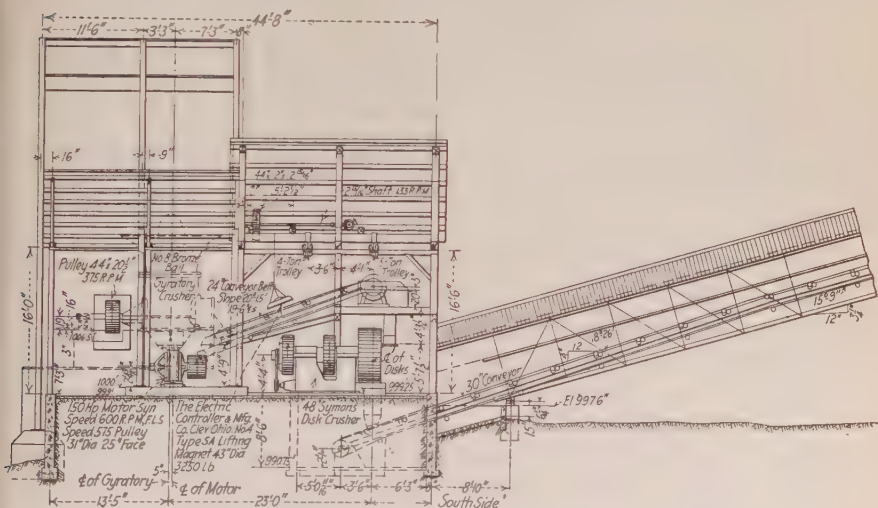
ELEVATION OF NO. 1 CRUSHING PLANT, AS INSTALLED.
